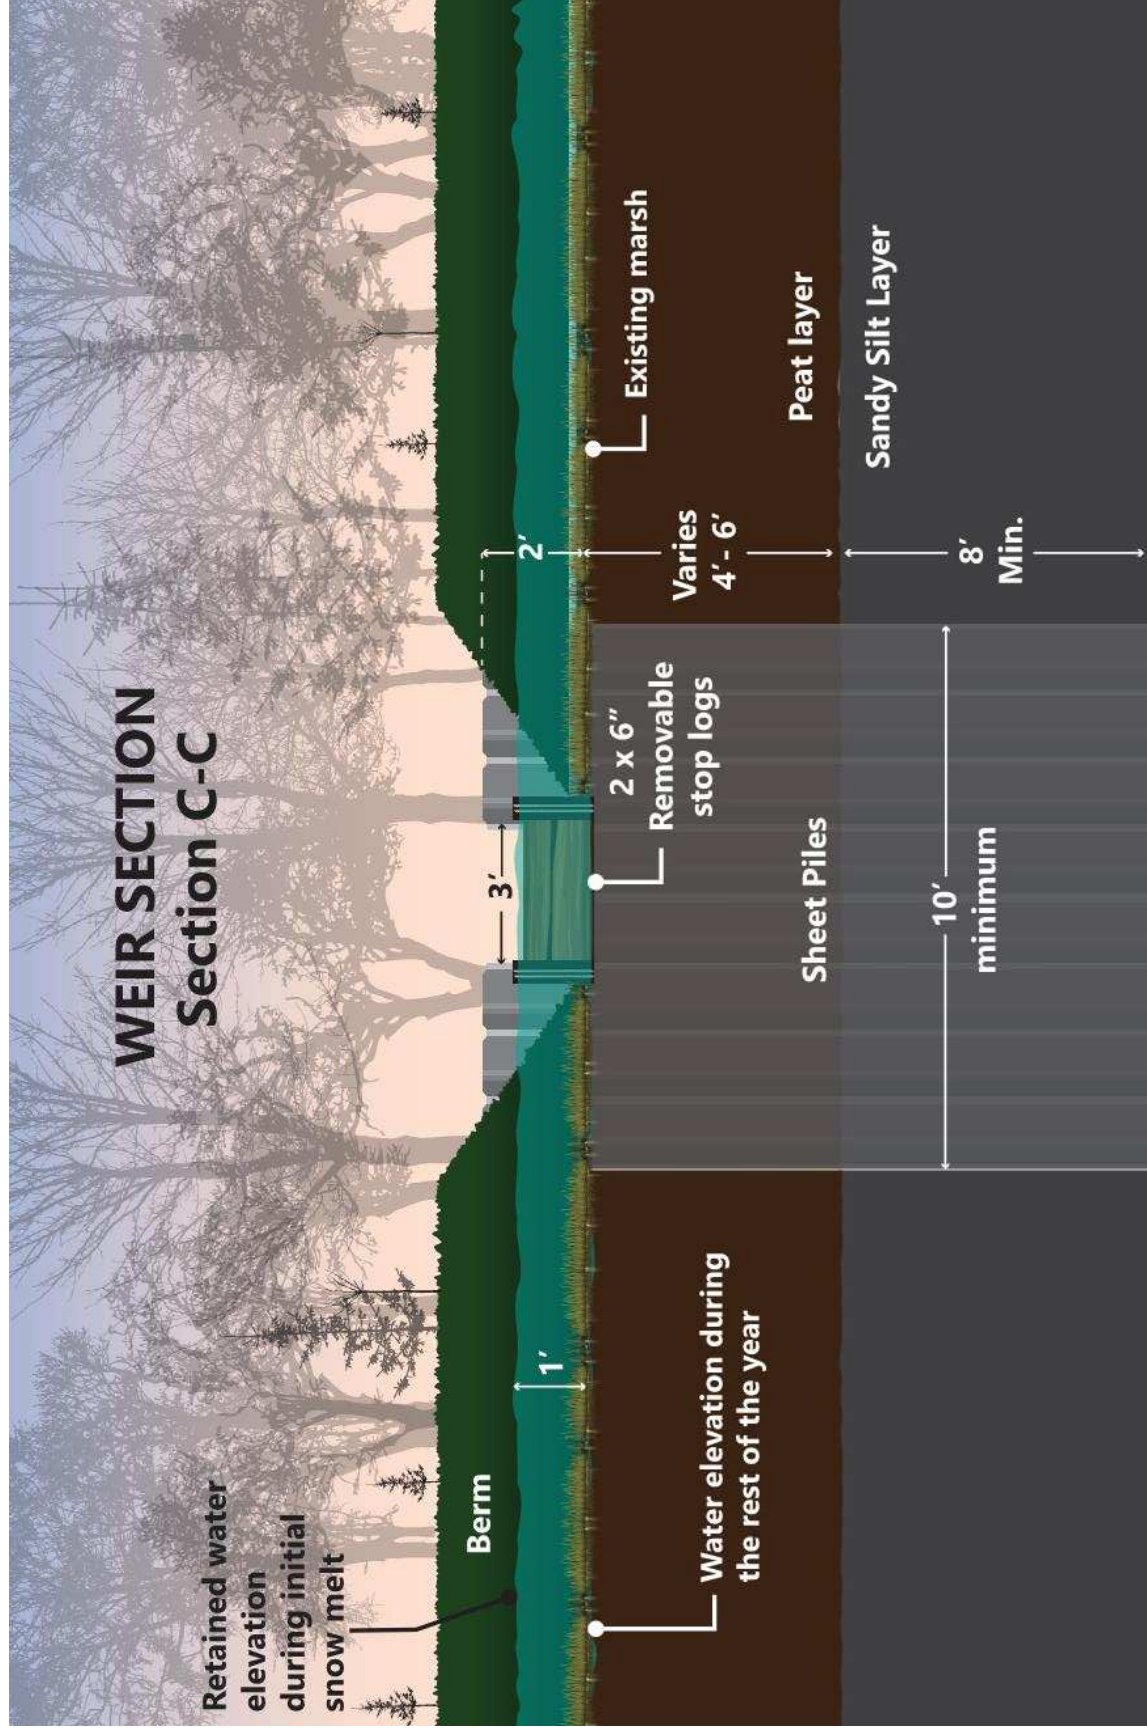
Snow Disposal Concept Design, Section C-C, Weirs, looking out of the site.
